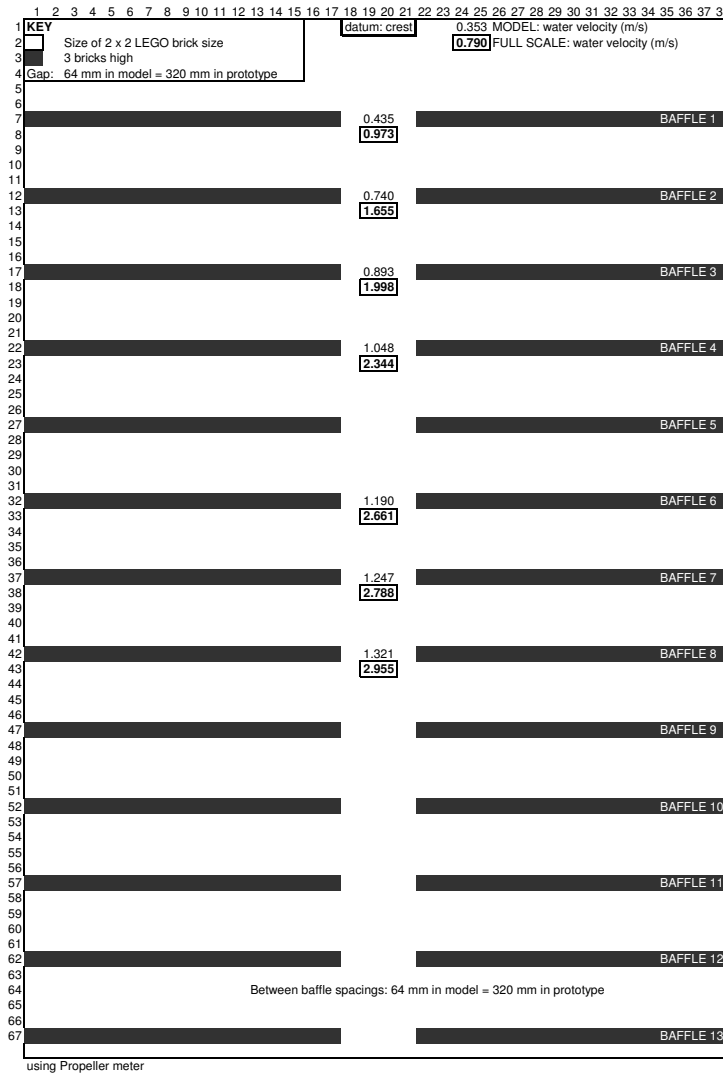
Centre Channel: Plan of Baffle Layout 1
